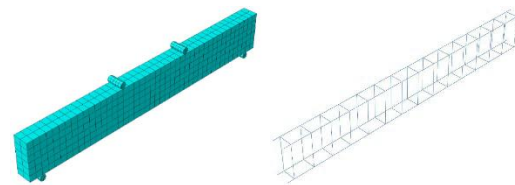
The reinforcement cage for a beam in addition to the concrete beam model.
